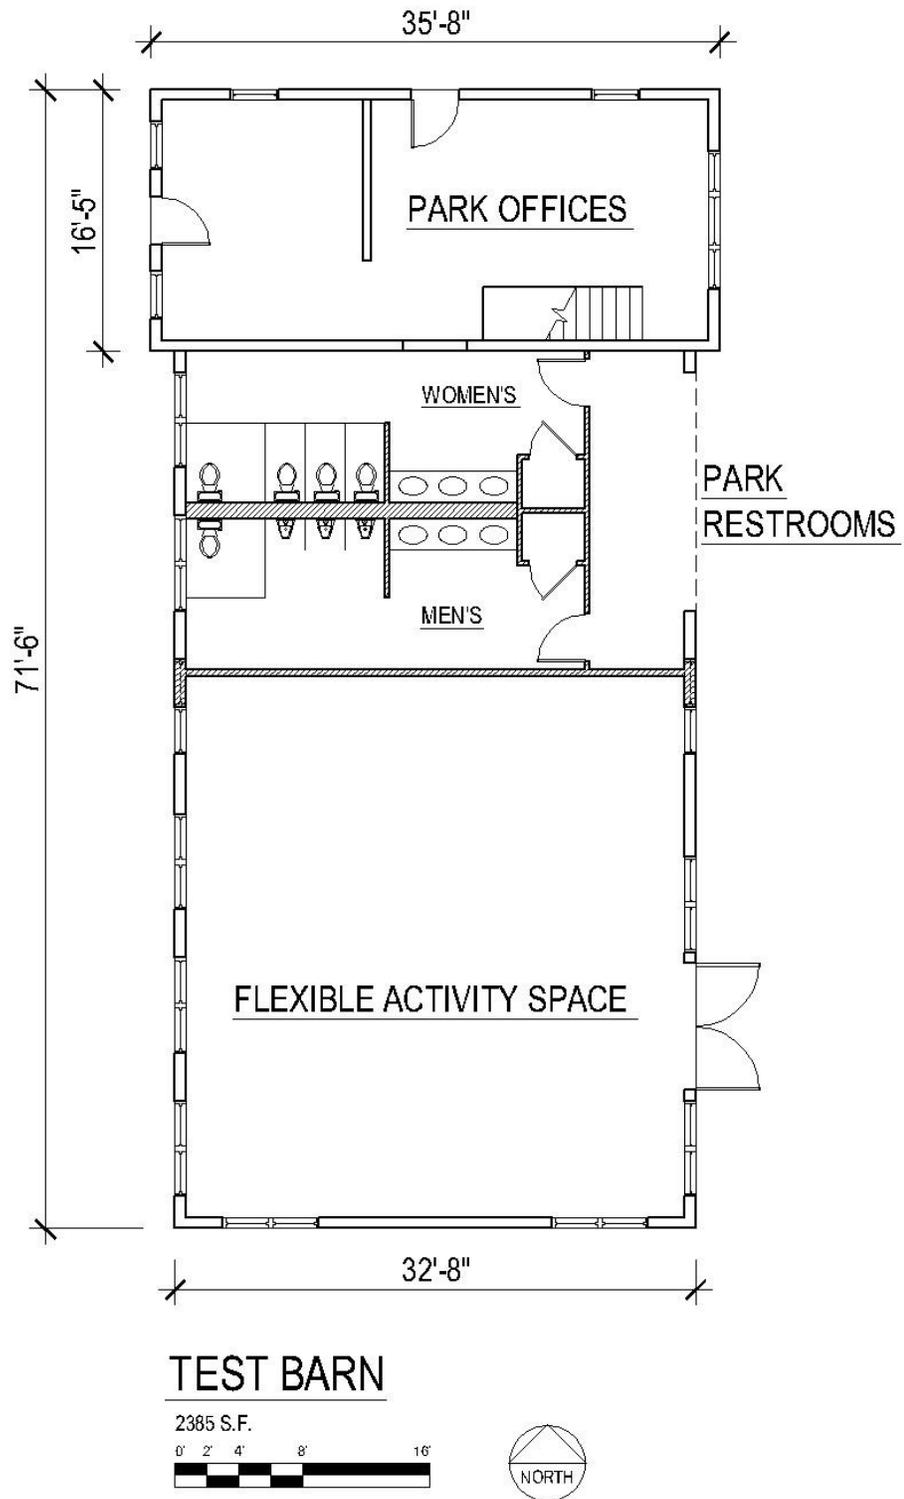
Because of the open plan, barrier-free access, and the ability to insulate and condition the building, the Test Barn is well suited to adaptive use relating to the park.
